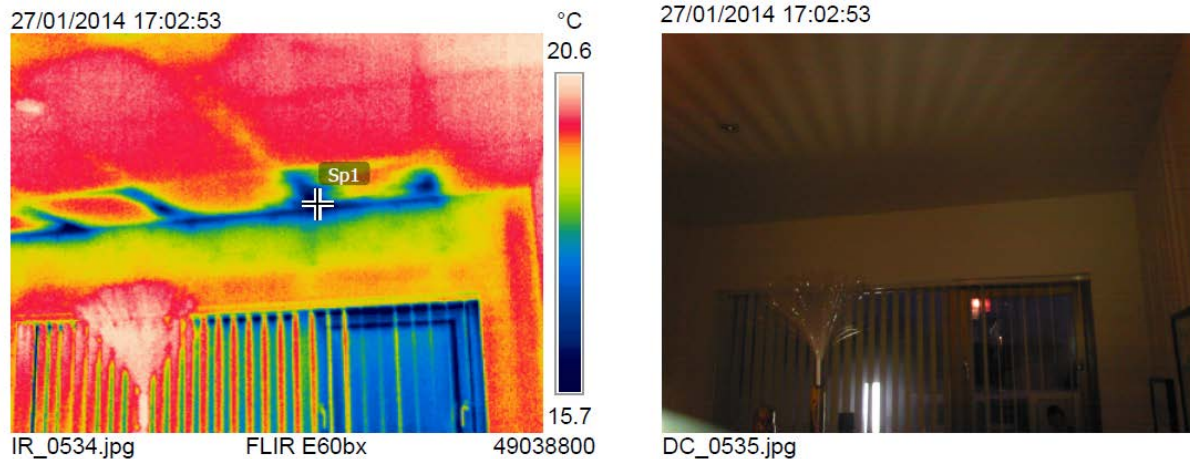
7: Thermal image of wall under test, highlighting location of repeating thermal bridge in living room ceiling.
